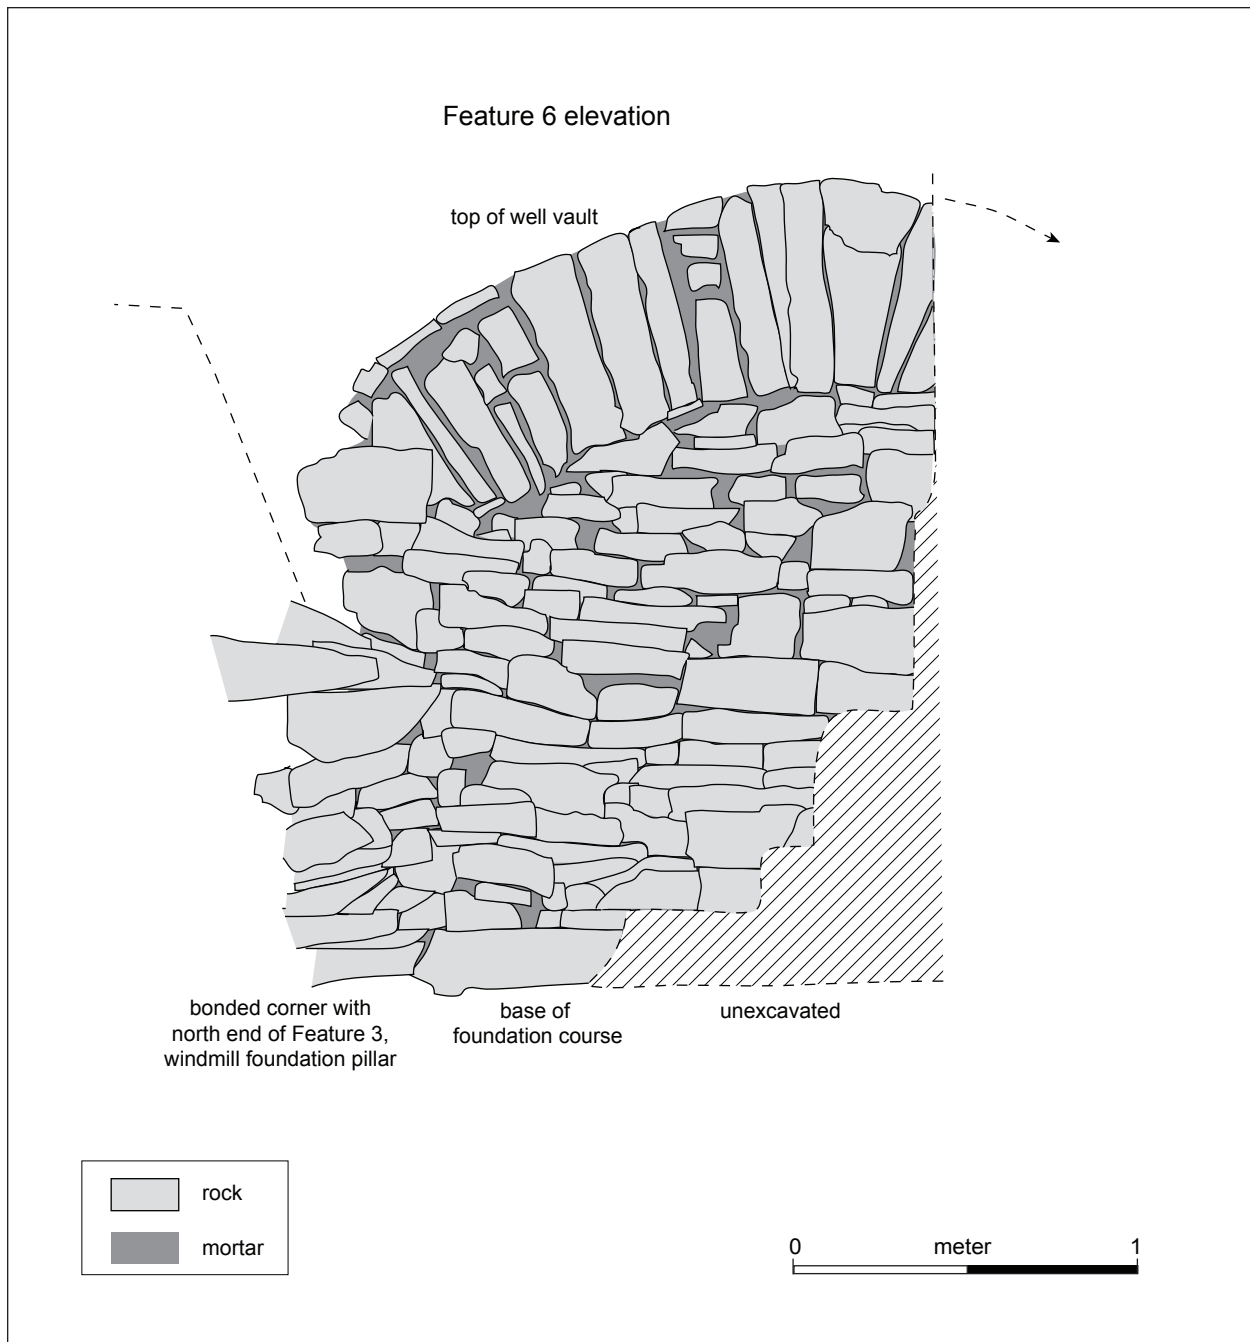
LA 146403, Feature 6, well vault, east elevation.
